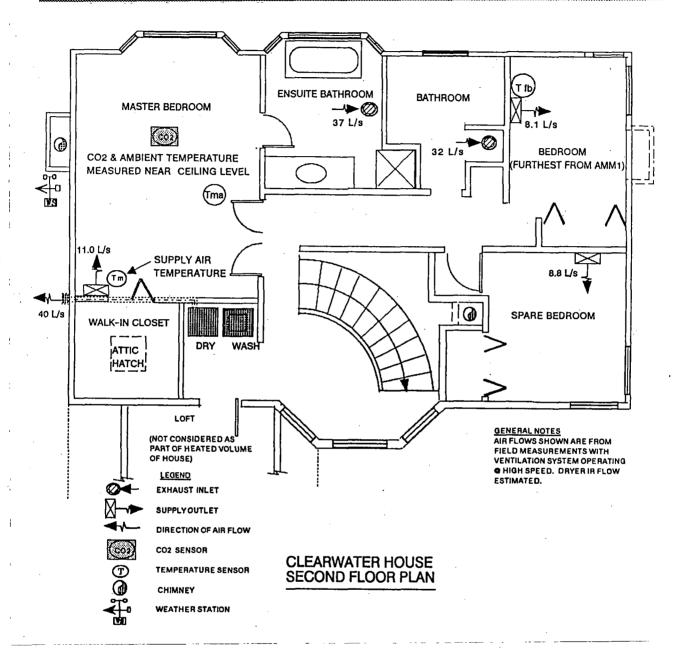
Second Floor Plan Showing Monitoring Sites & Air Distribution System
